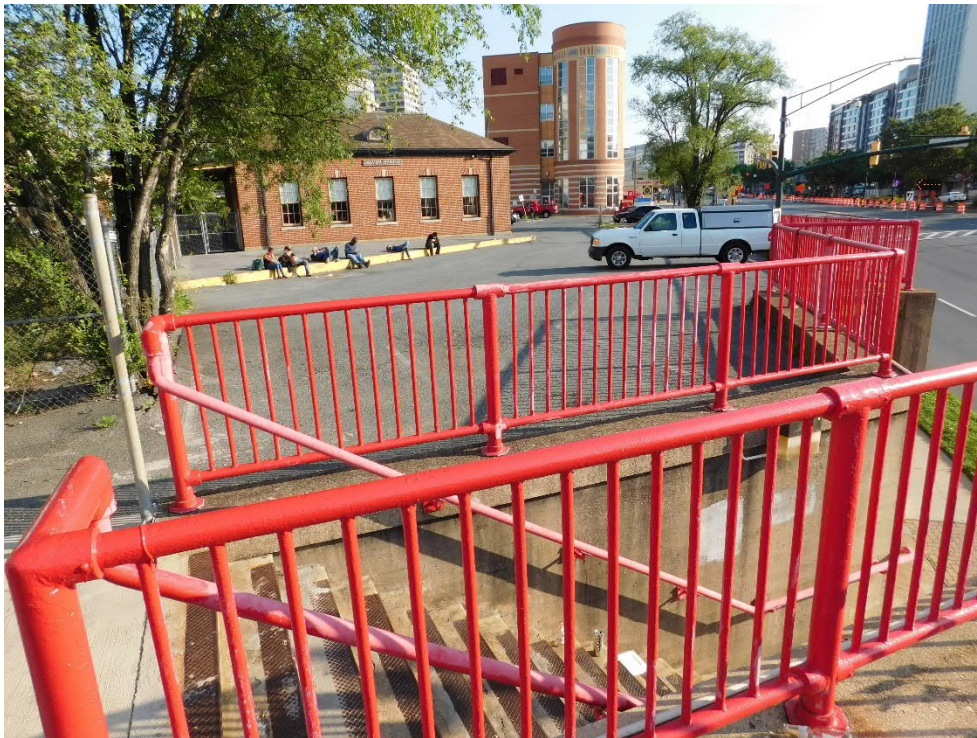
Existing stairs from the B&O station parking lot to Georgia Avenue
